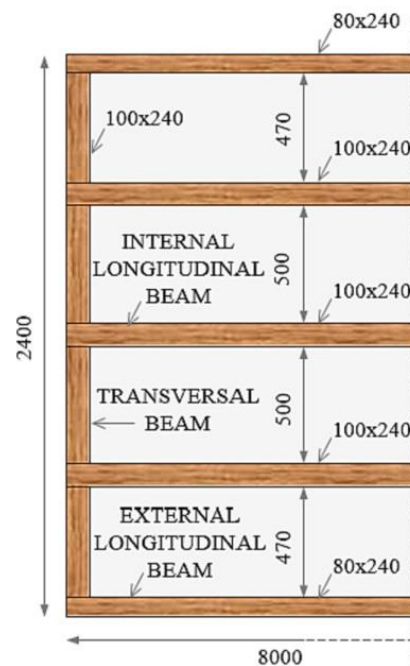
Plan from below of the timber-concrete composite floor shows the beam-frame with the geometry. (Ferrara et al., 2023).
